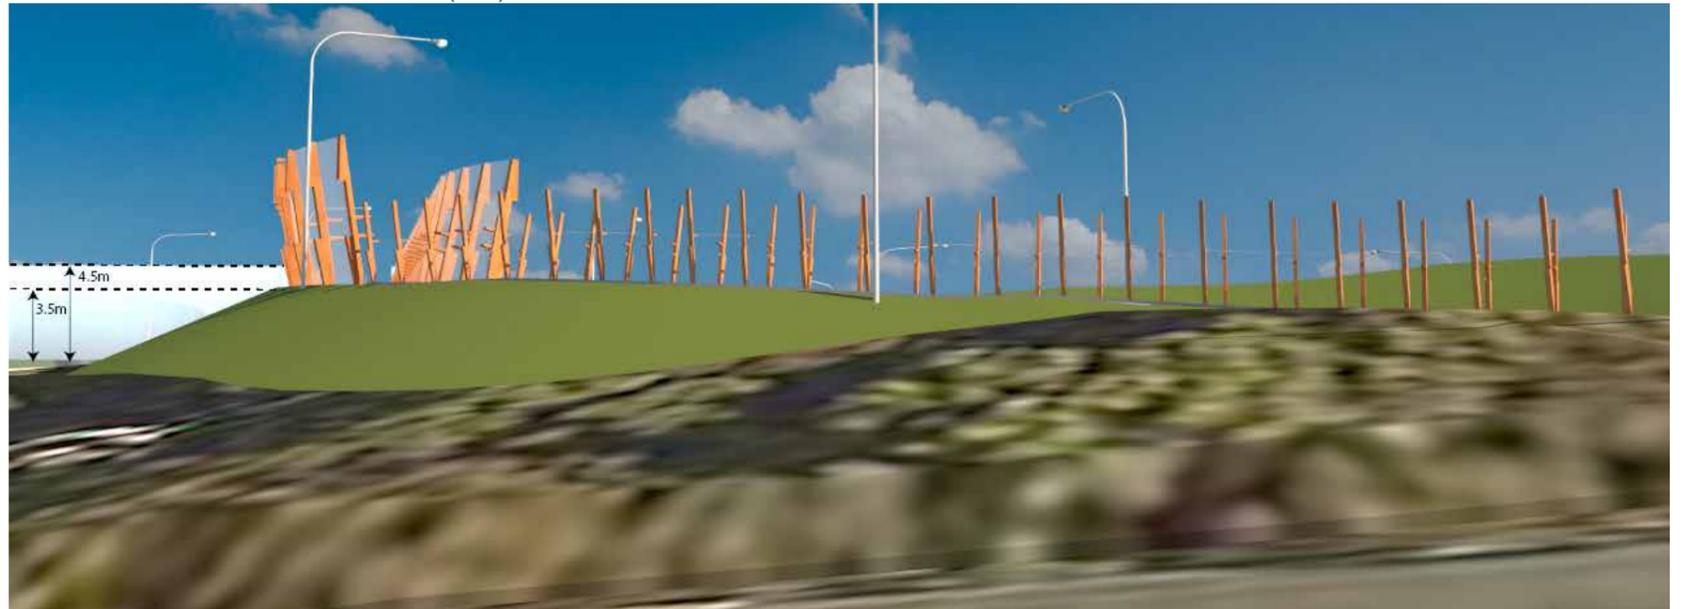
VP7 - Proposal showing the potential range of noise wall heights and planting at road opening
